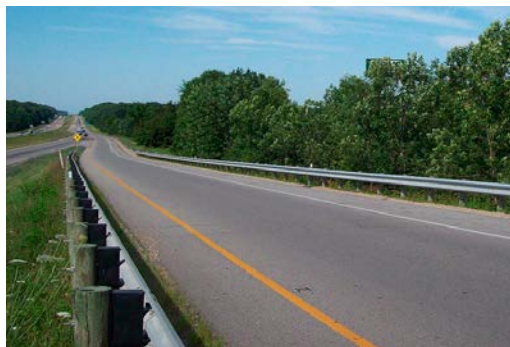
POSSIBLE FREEWAY CONNECTION
